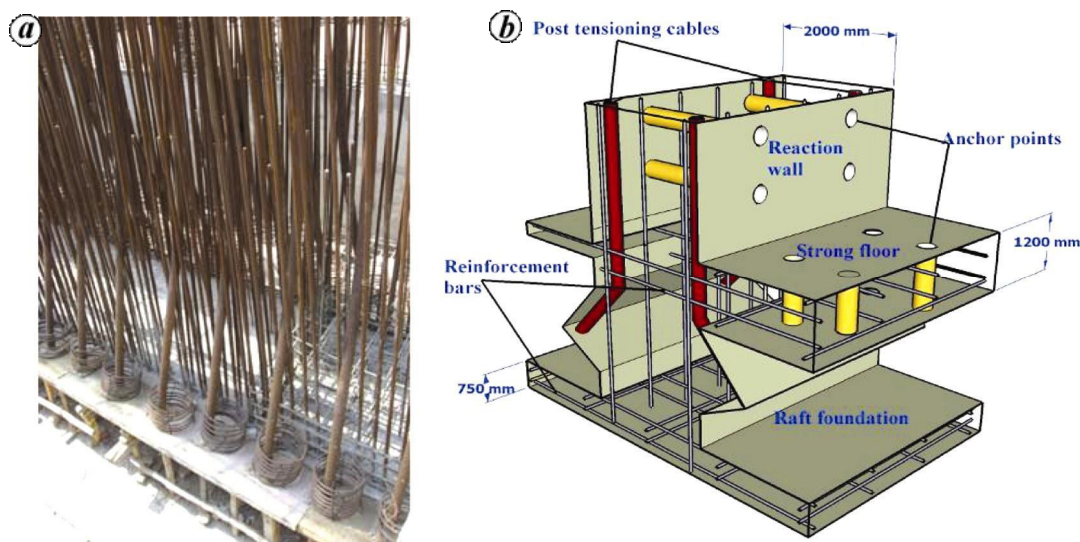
Arrangement of post-tensioning system for reaction walls. *a*, Placement of ducts for post-tensioning cables during construction phase. *b*, Cross-section of the wall showing typical arrangements of main reinforcements, anchor points and post-tensioning cables.
